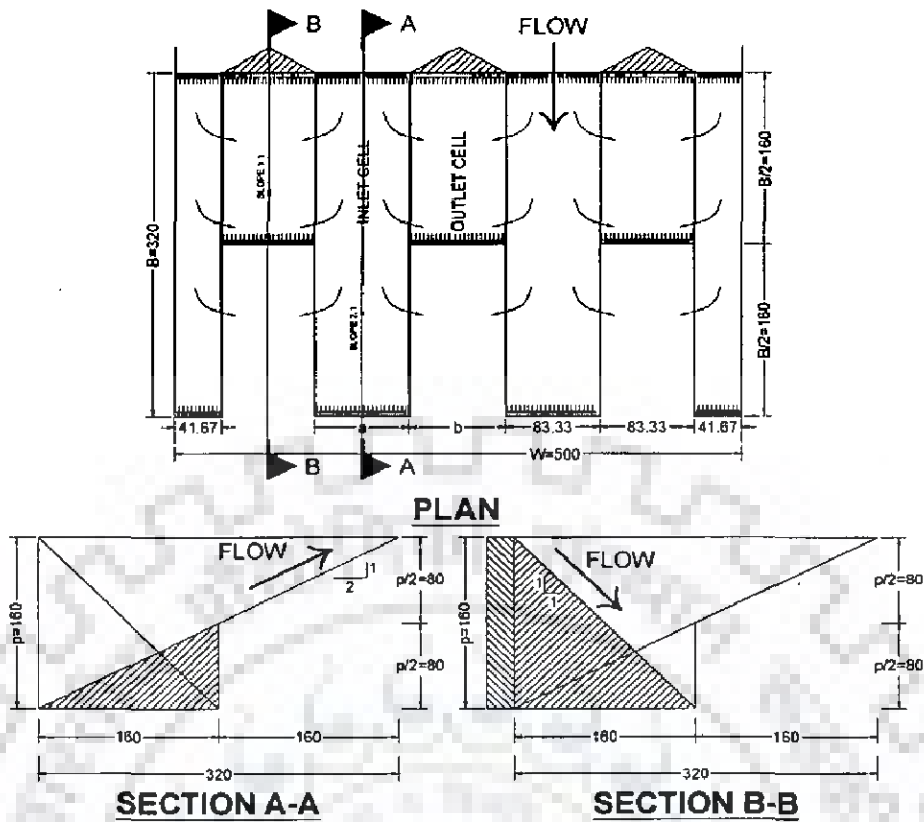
Plan and section of model  $P_4M_3$  with inlet modification (dimensions in mm)
